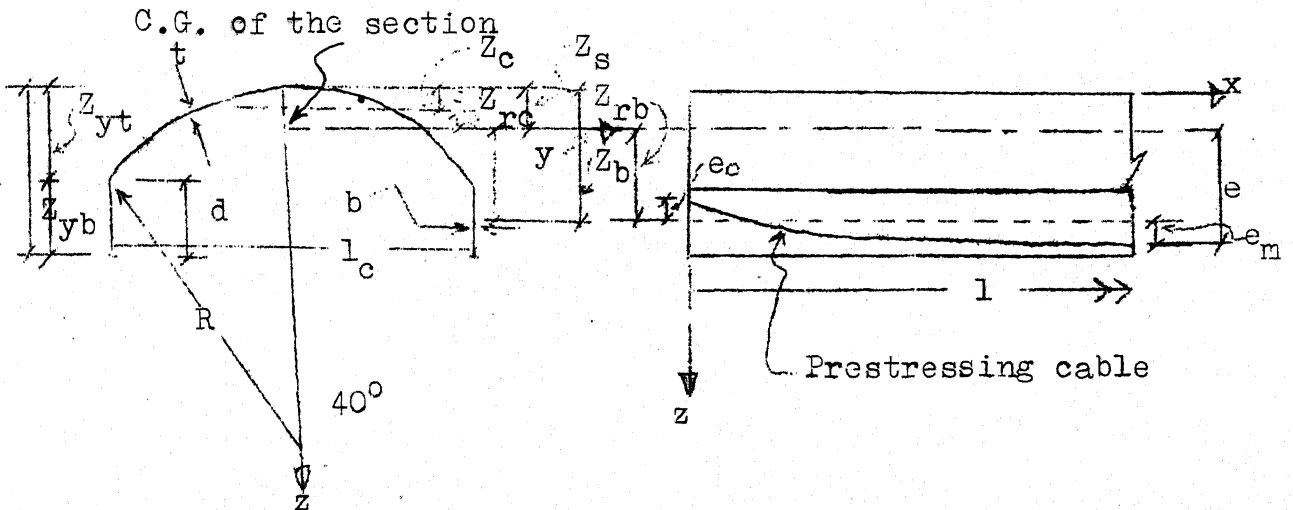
GEOMETRICAL PROPERTIES OF ASSUMED BEAM SECTION OF EXAMPLE 1
